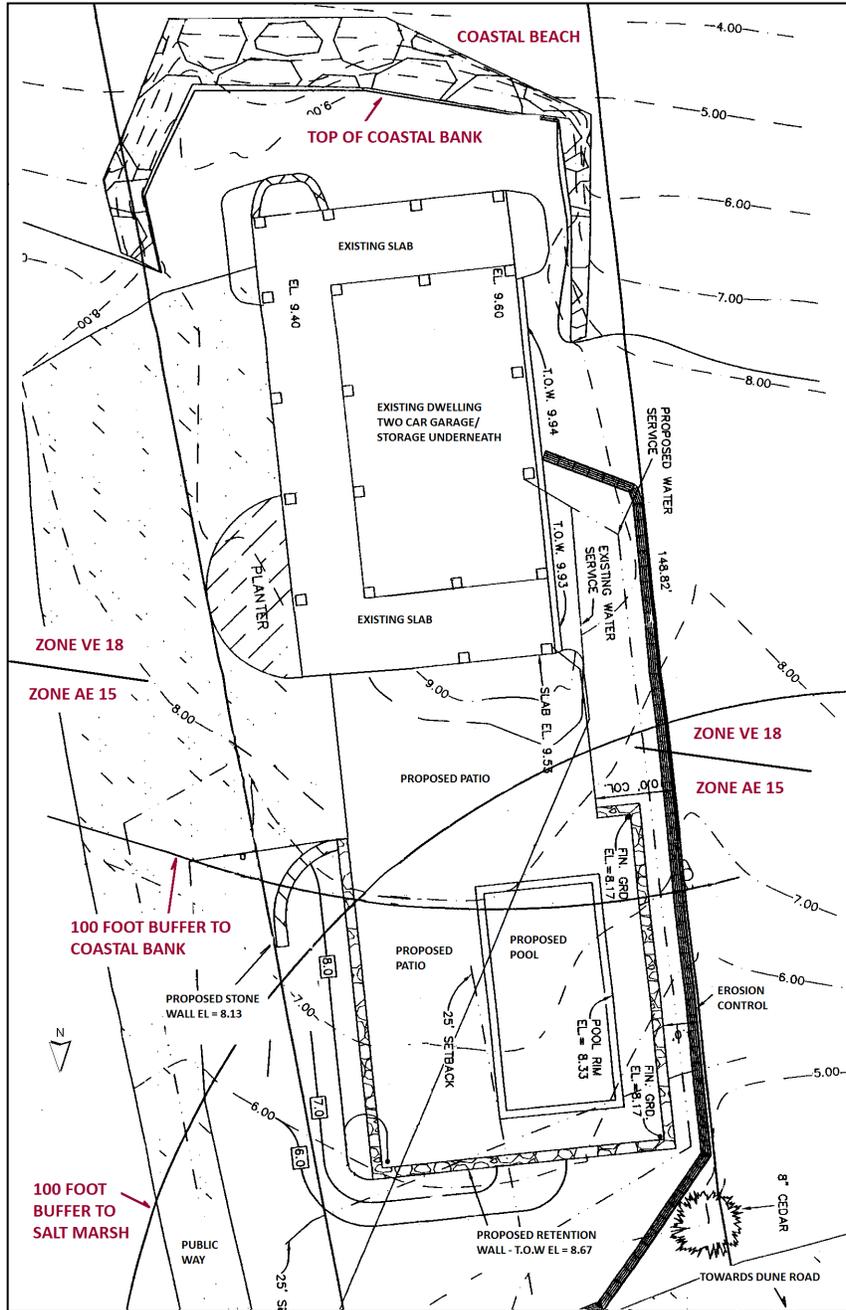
An applicant's plan showing a proposed pool, patio, and retaining walls, along with resource areas and buffer zones as delineated by the applicant.
